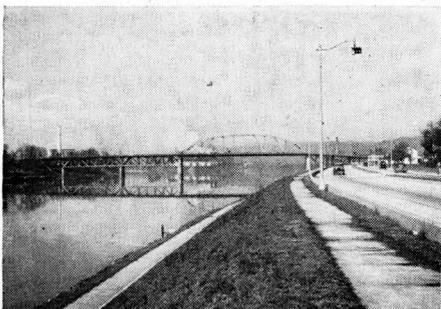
Patrick Street Bridge—From North Side of River Looking West
